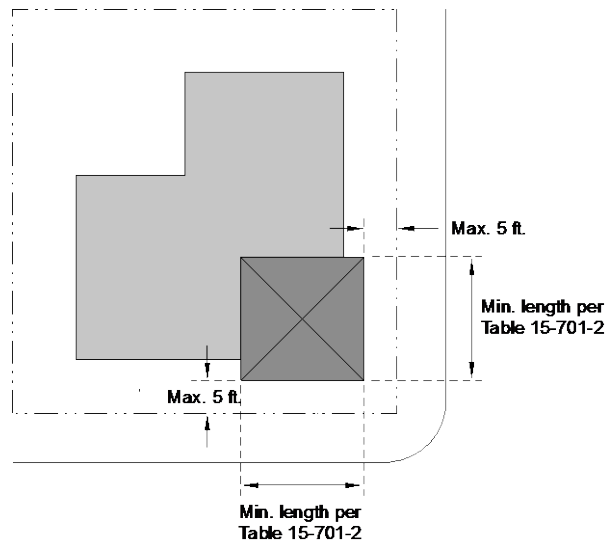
F: CORNER FRONTAGE STANDARDS
